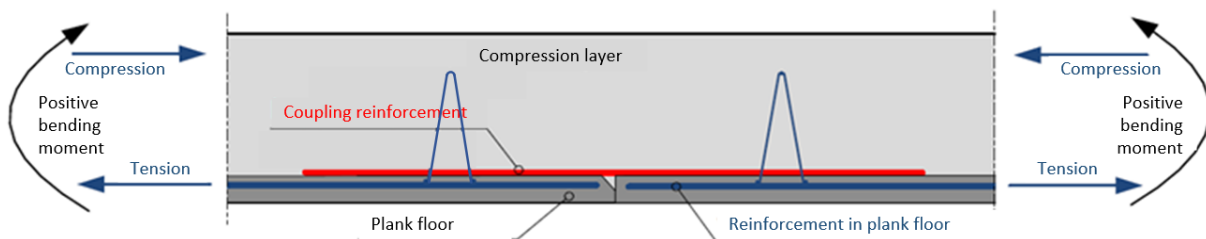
Detail with problem for plank floors (Wijte, 2019)
